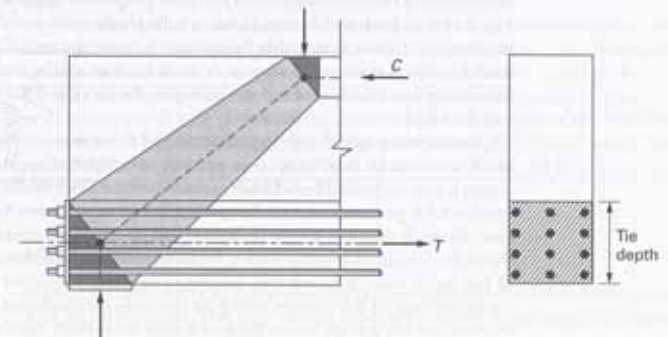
Tension tie consisting of several layers of reinforcement plus a portion of surrounding concrete.
